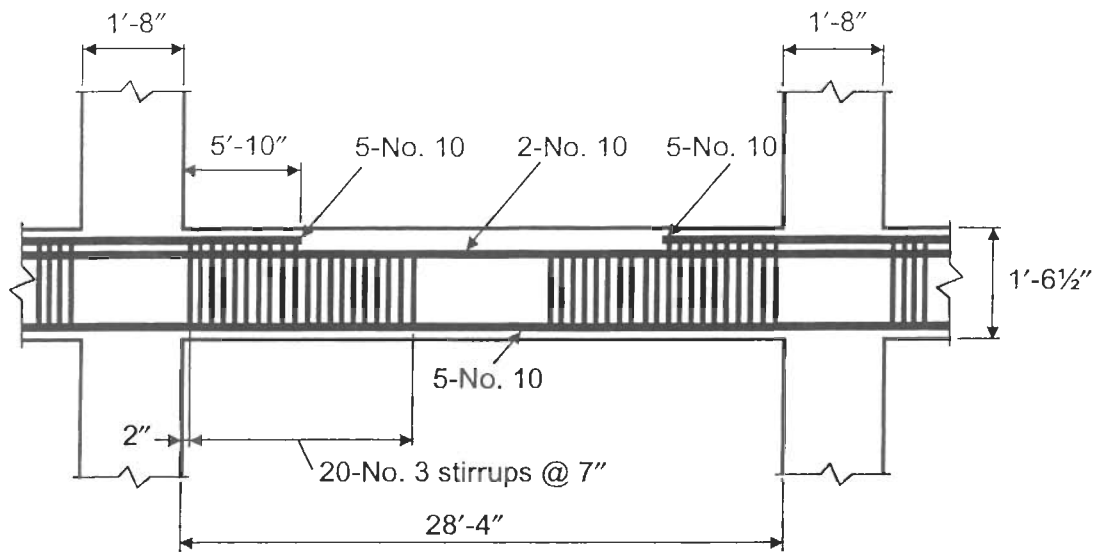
Reinforcement Details for Beam B3-C3 at Floor Level 1 (SDC B)
